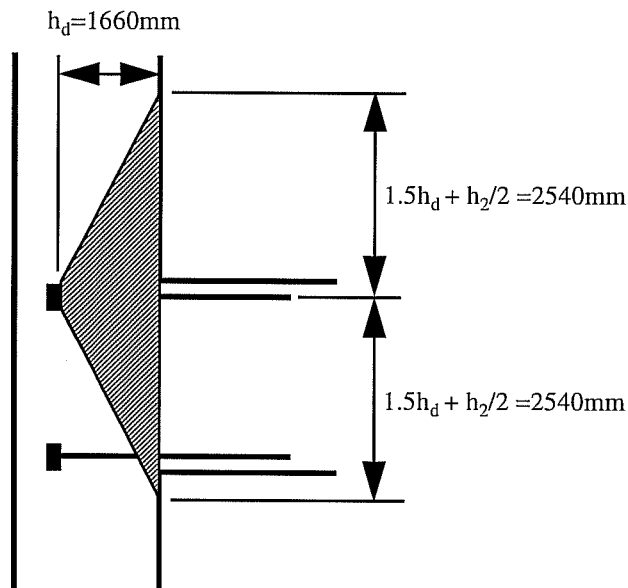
Pullout-Cone Failure for Beam-Column Joint Design Example
